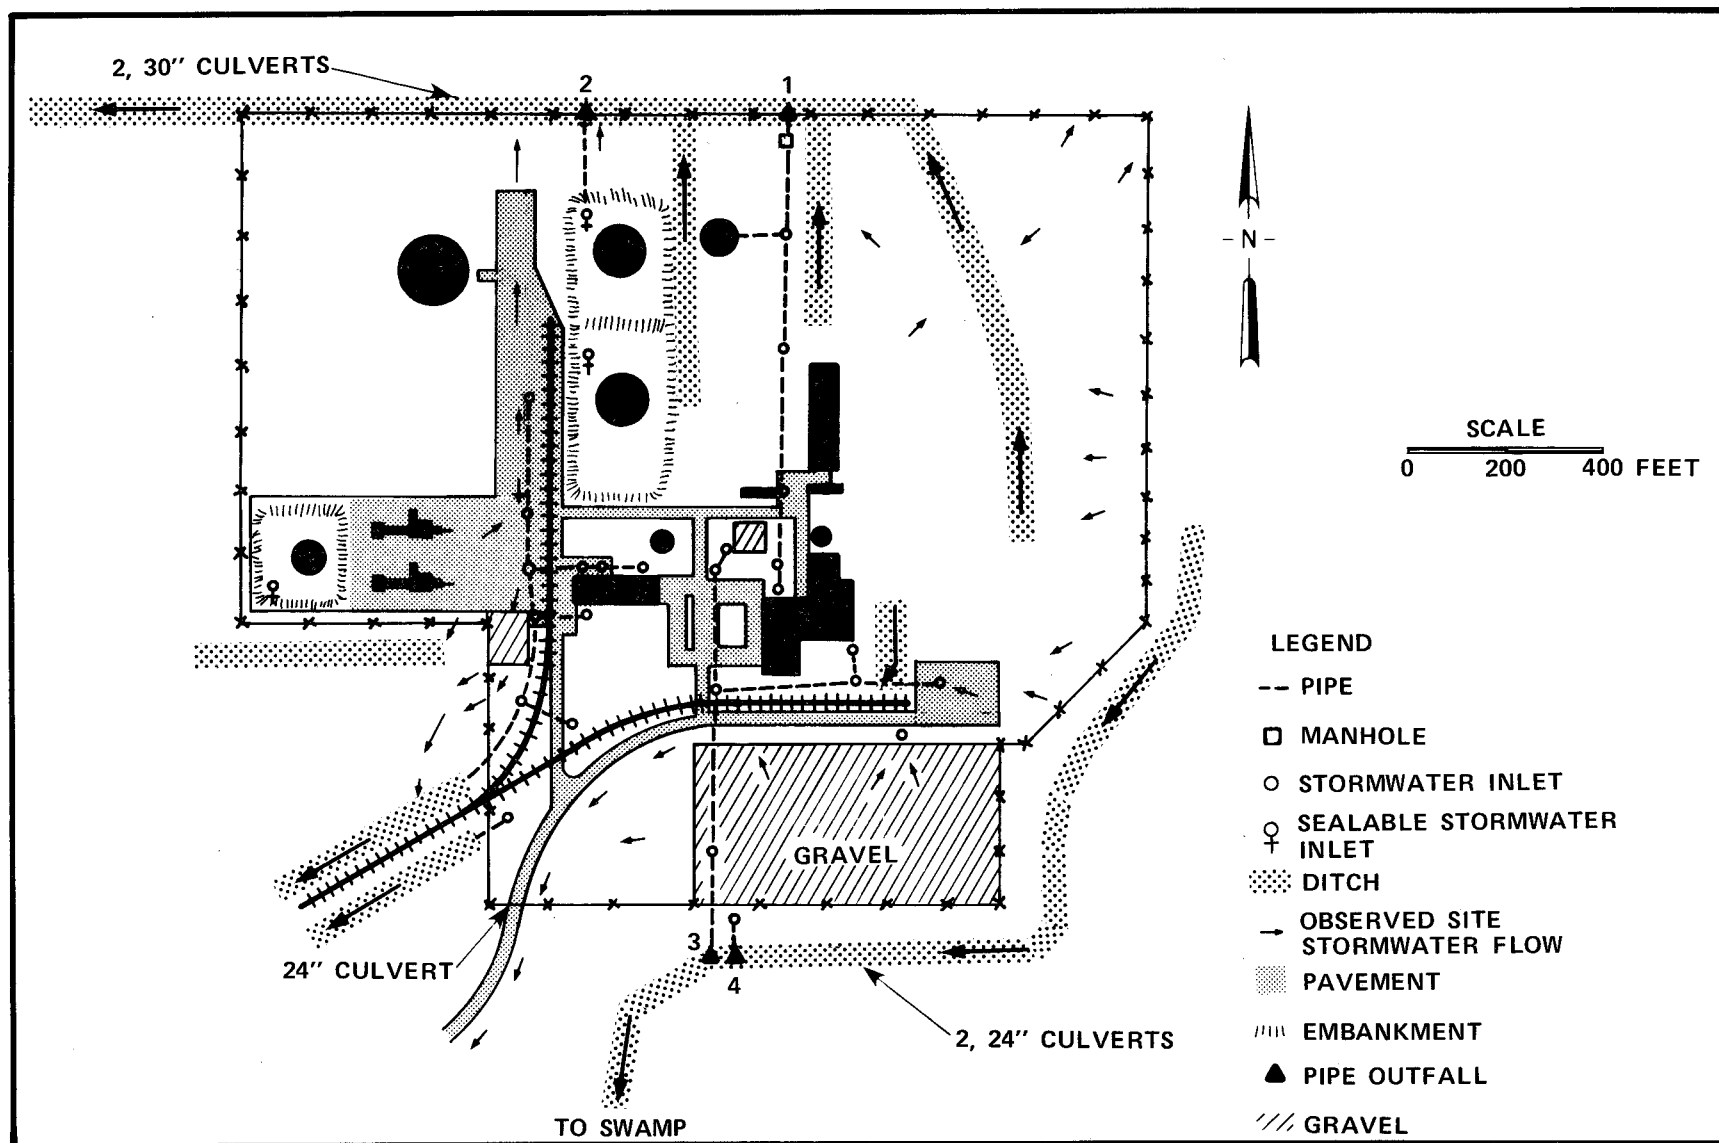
DRAINAGE OF THE EXISTING DEERHAVEN IMPROVED SITE AREA.
